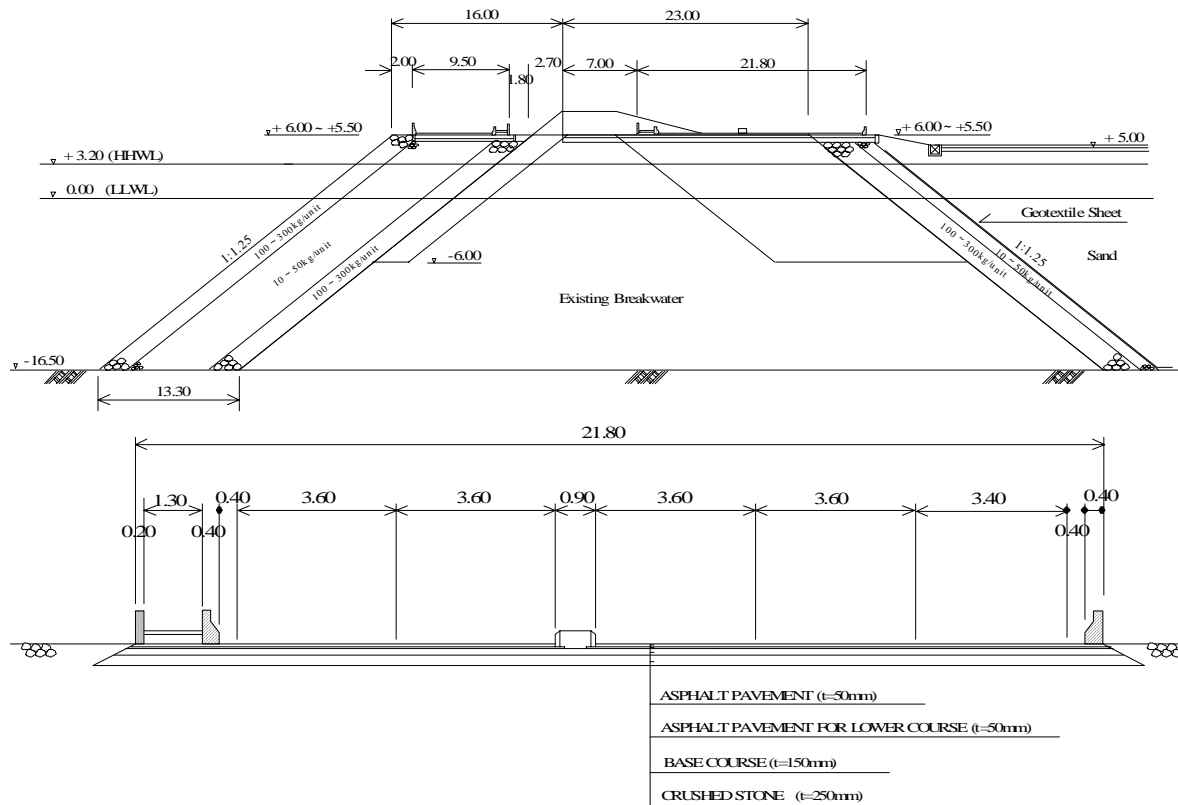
Cross Section of Port Road on Existing Breakwater
